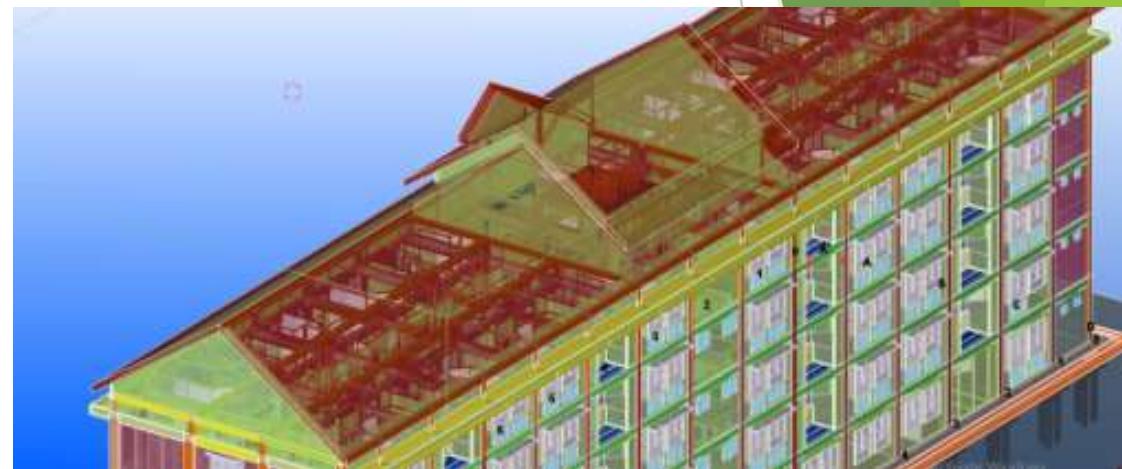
BIM Application in Precast Concrete Detailer in Low Cost Housing of Ministry of Public Works 1
